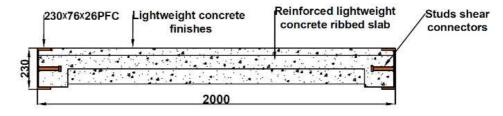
Prefabricated ultra-shallow flooring system (PUSS) [29, 30]
